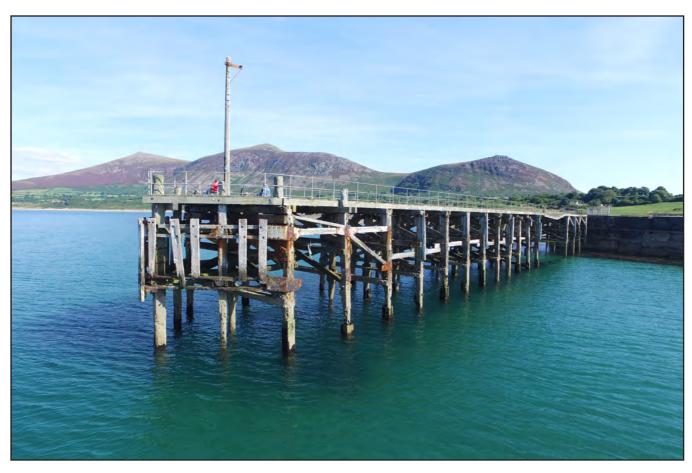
View of Trefor pier from the northwest showing the terminus and the truesses on the west-southwest side of the pier (UAV image: DJI_0153)
